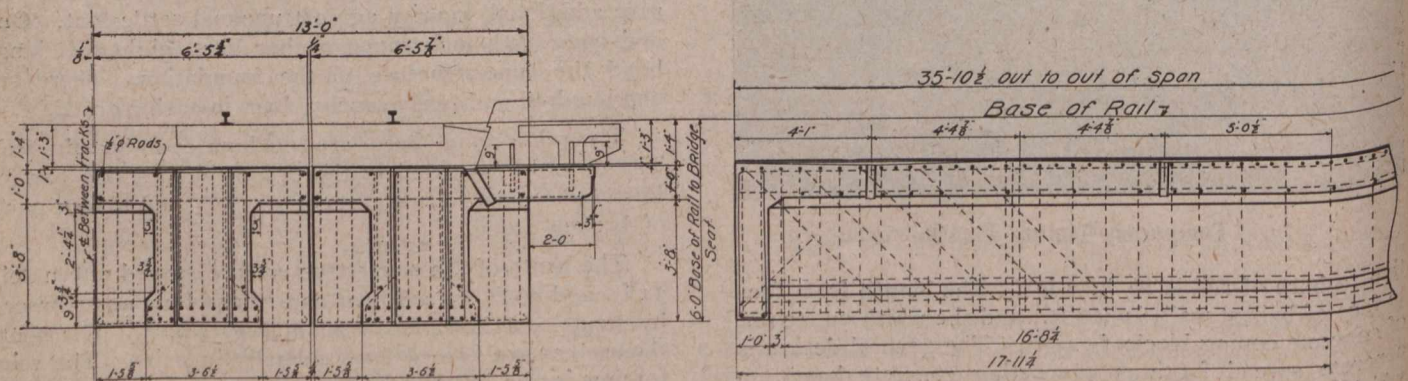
Cross-Section and Longitudinal Section of Inner and Outer Slabs
